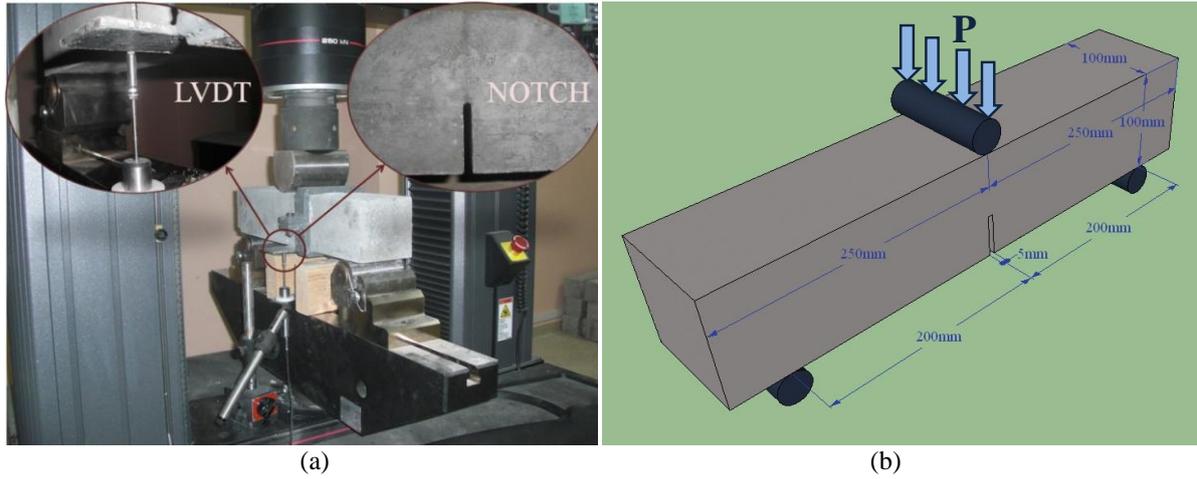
Views of a) experimental setup for three point bending test and b) dimensions of the notched beam specimen.
